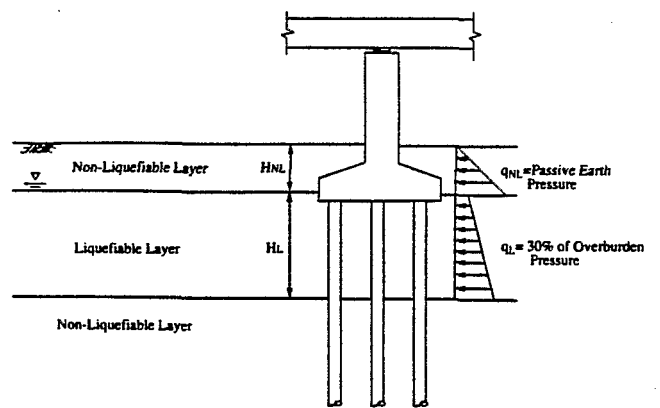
Limit equilibrium method for design of bridge deep foundations subjected to lateral spreading (Japan Road Association, 1996; Yokoyama et al., 1997).
